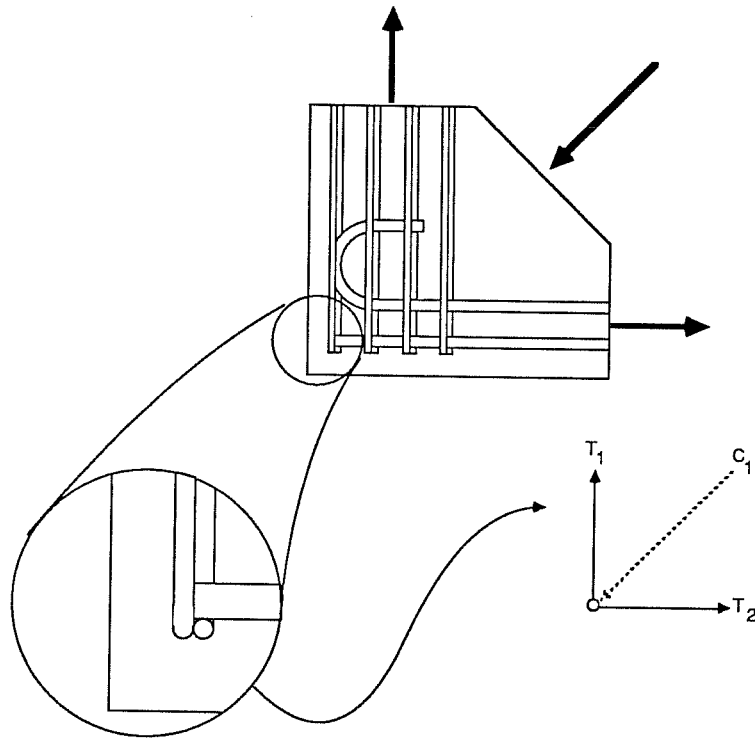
Placement of Reinforcement and Corresponding Strut-and-Tie Model and Termination Point of Straight Bars
